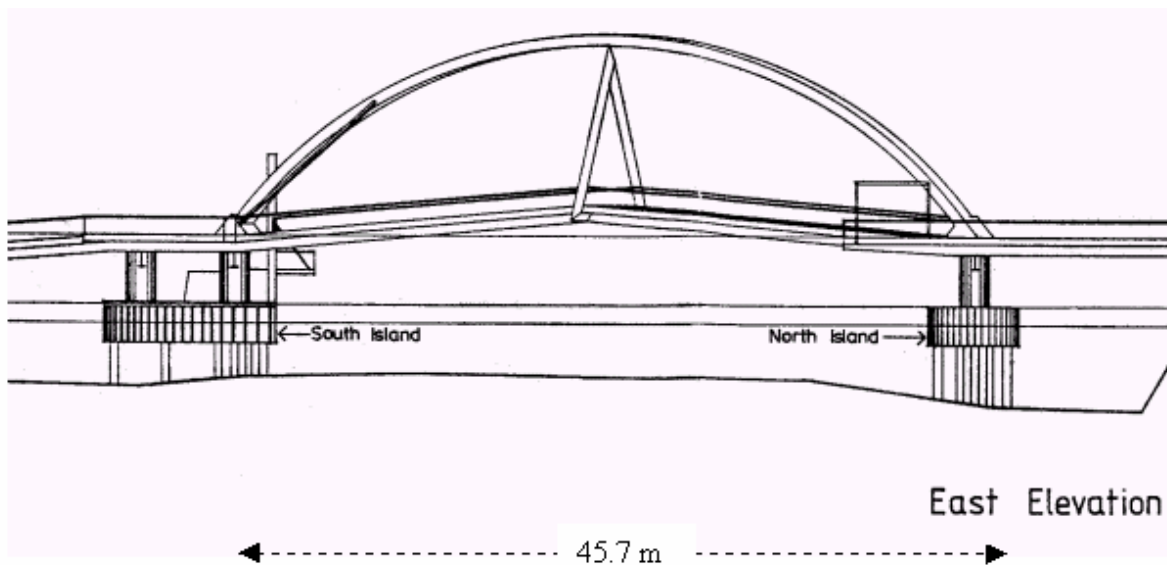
East elevation of the footbridge (Architects' drawing).
